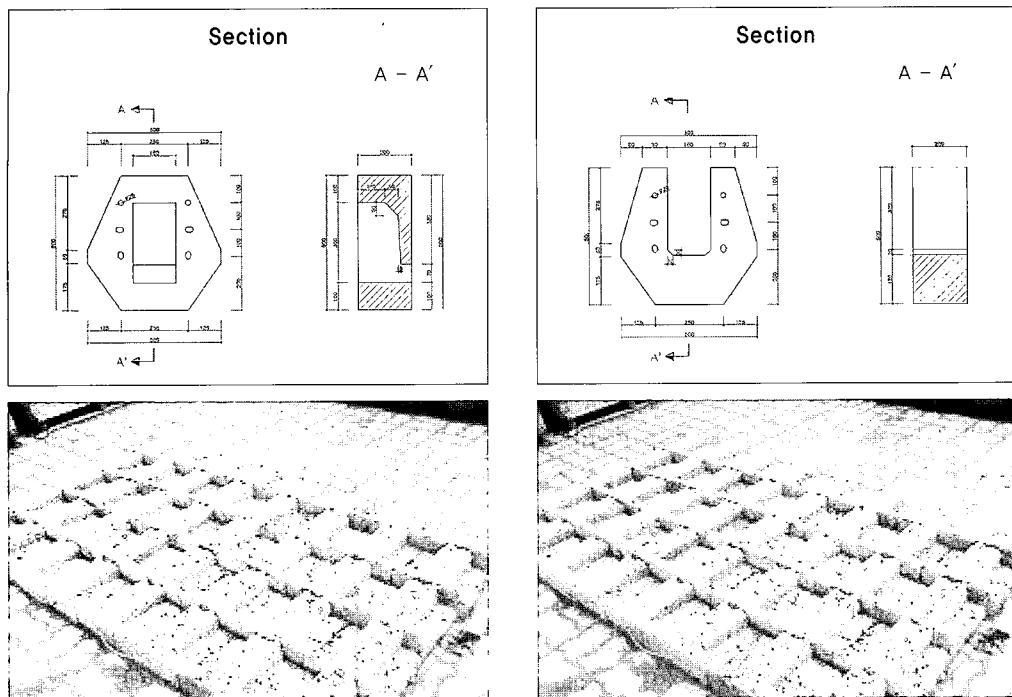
Drawing and construction photo of Geo-green Loess retaining
